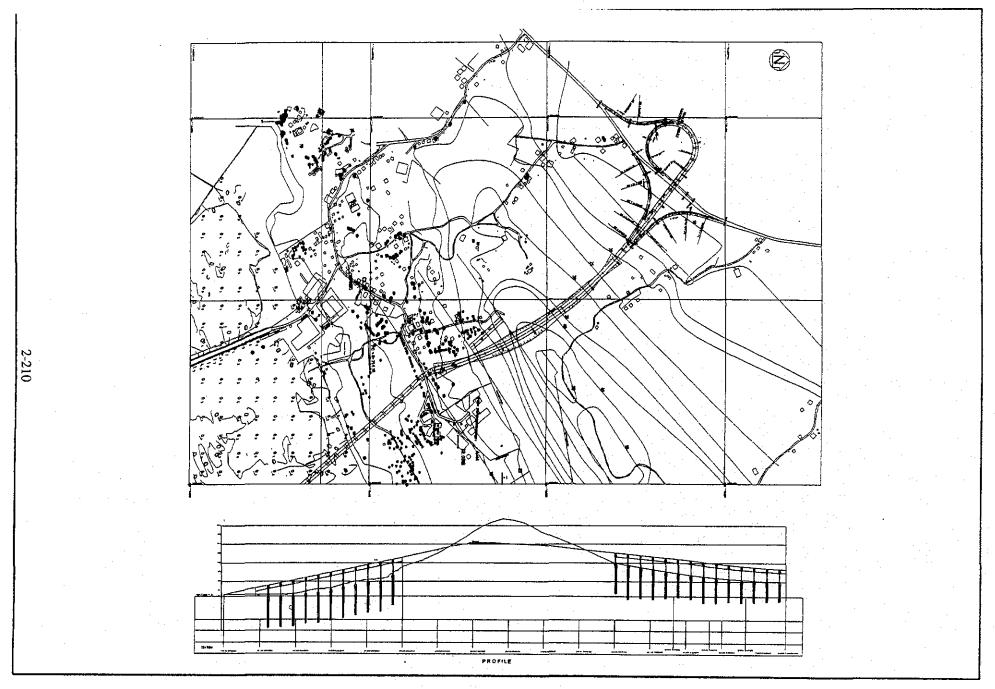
Access Road Alignment and Longitudinal Section
